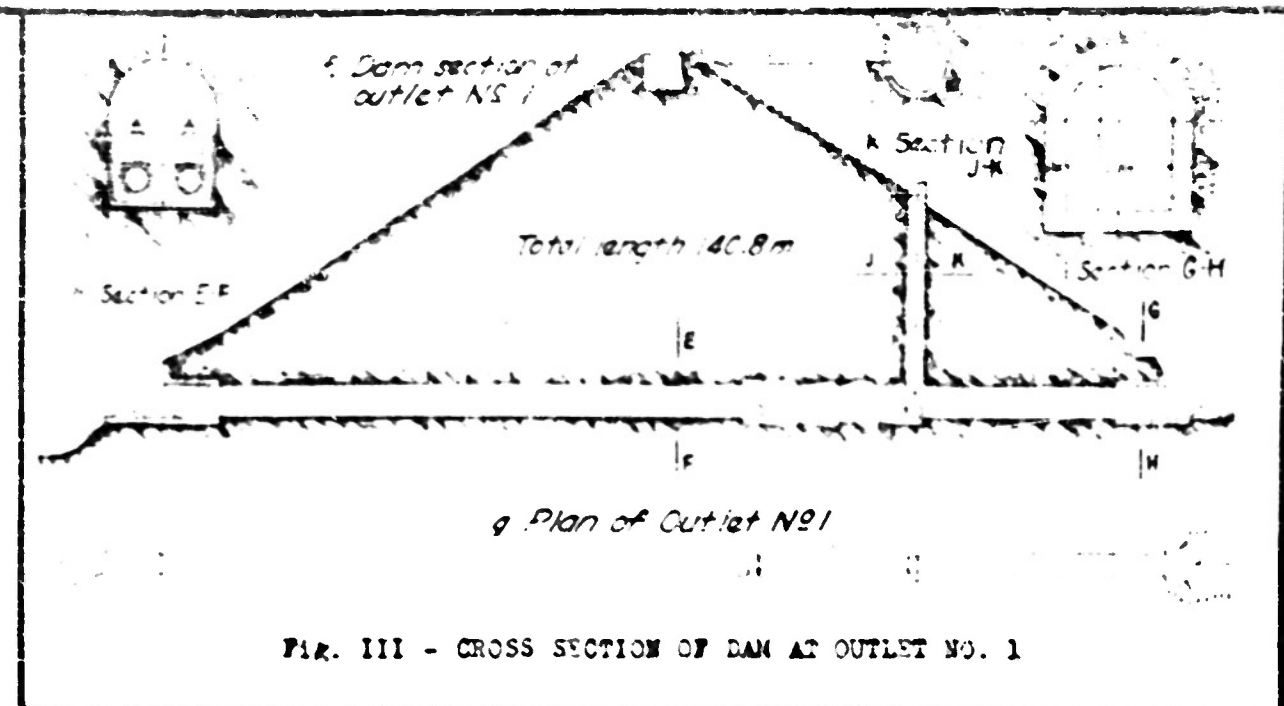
Fig. III - CROSS SECTION OF DAM AT OUTLET NO. 1
